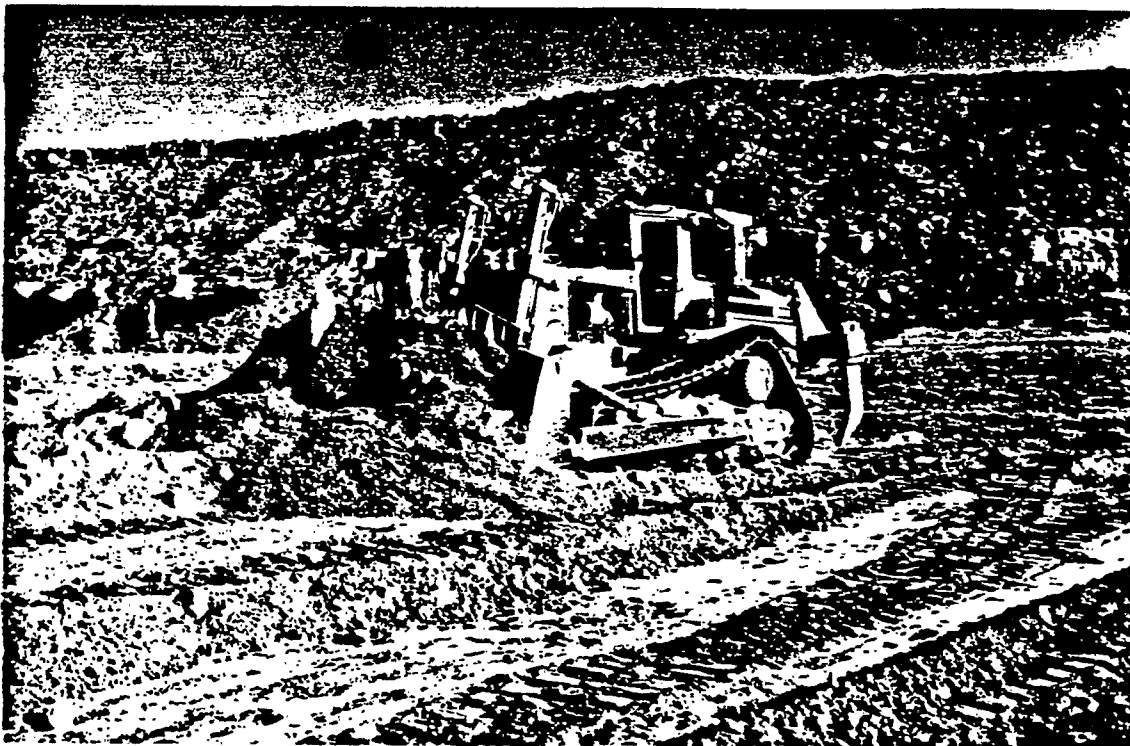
N pushes "clean" fill over burried protore and mine tailings on Section 24 (Brown-Nanabah). Note, Haystack Mountain in background. (photo by Robert Bornstein)
